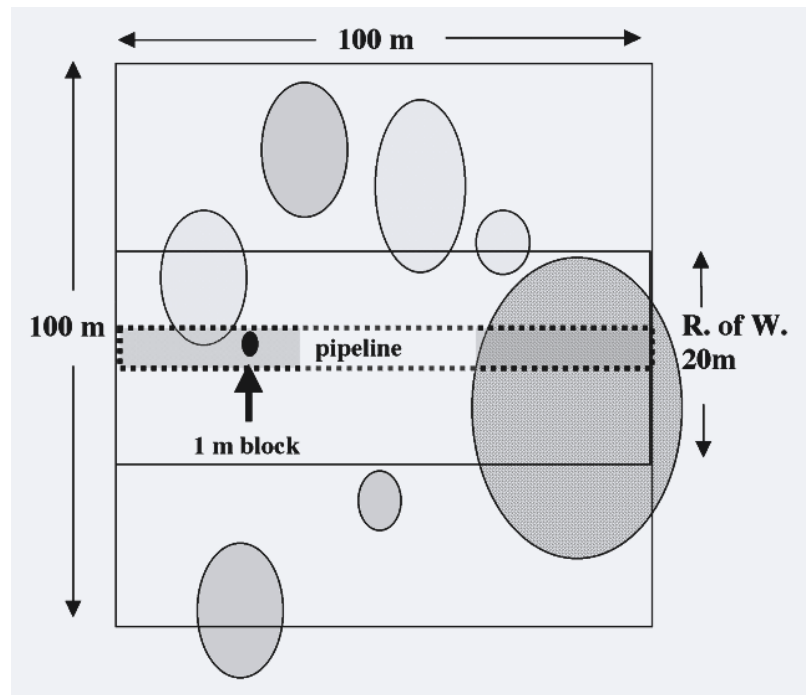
Sketch showing various scales of interest for an area where a 20 m wide road and 2 m wide, 2 m deep pipeline trench will be excavated in a melange bimrock.
